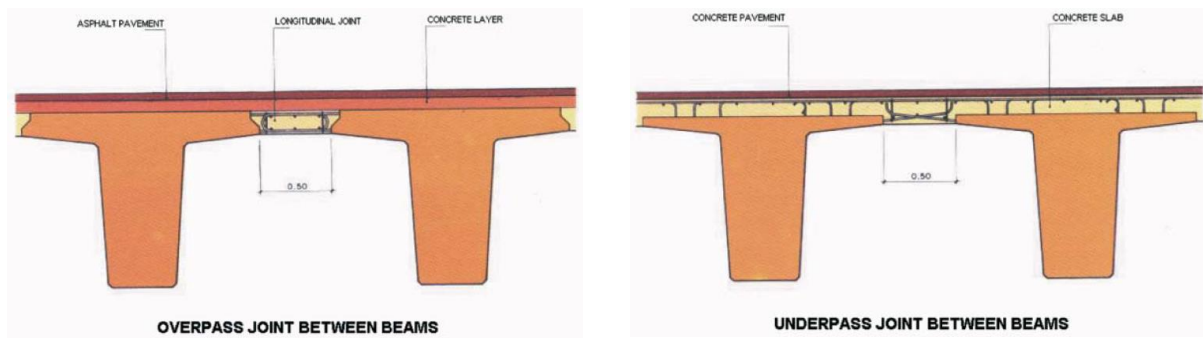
Longitudinal Connection between Bulb Tee Beams [U5]
